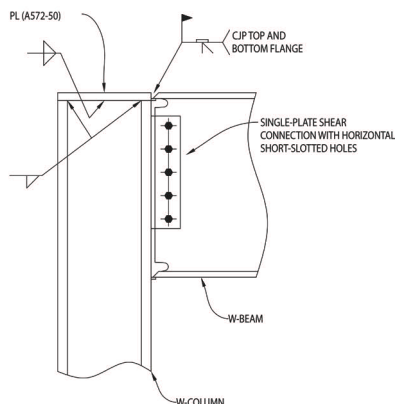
Directly Welded Moment Connection at Top of Column
